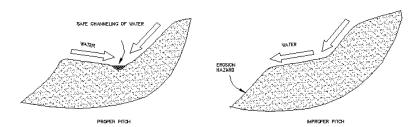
Hillside Pitch of Roadway and Proper Ditch Location
